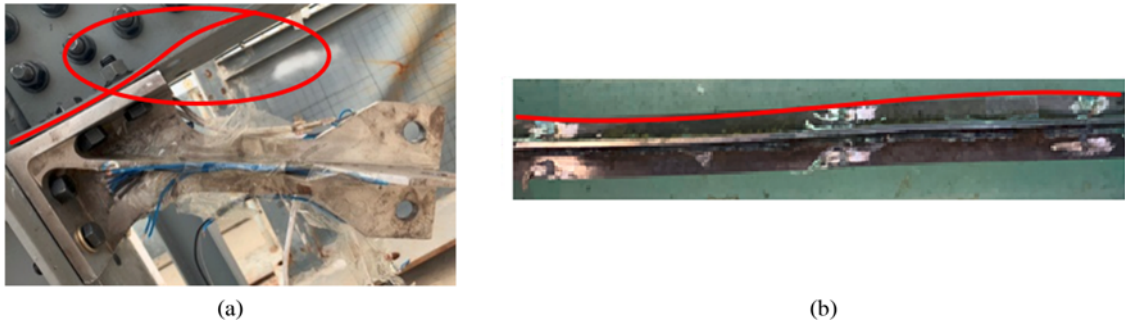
Failure Mode of Specimen: (a) Bottom Flange Buckling at End of Beam, (b) Buckling at Core of BRB
